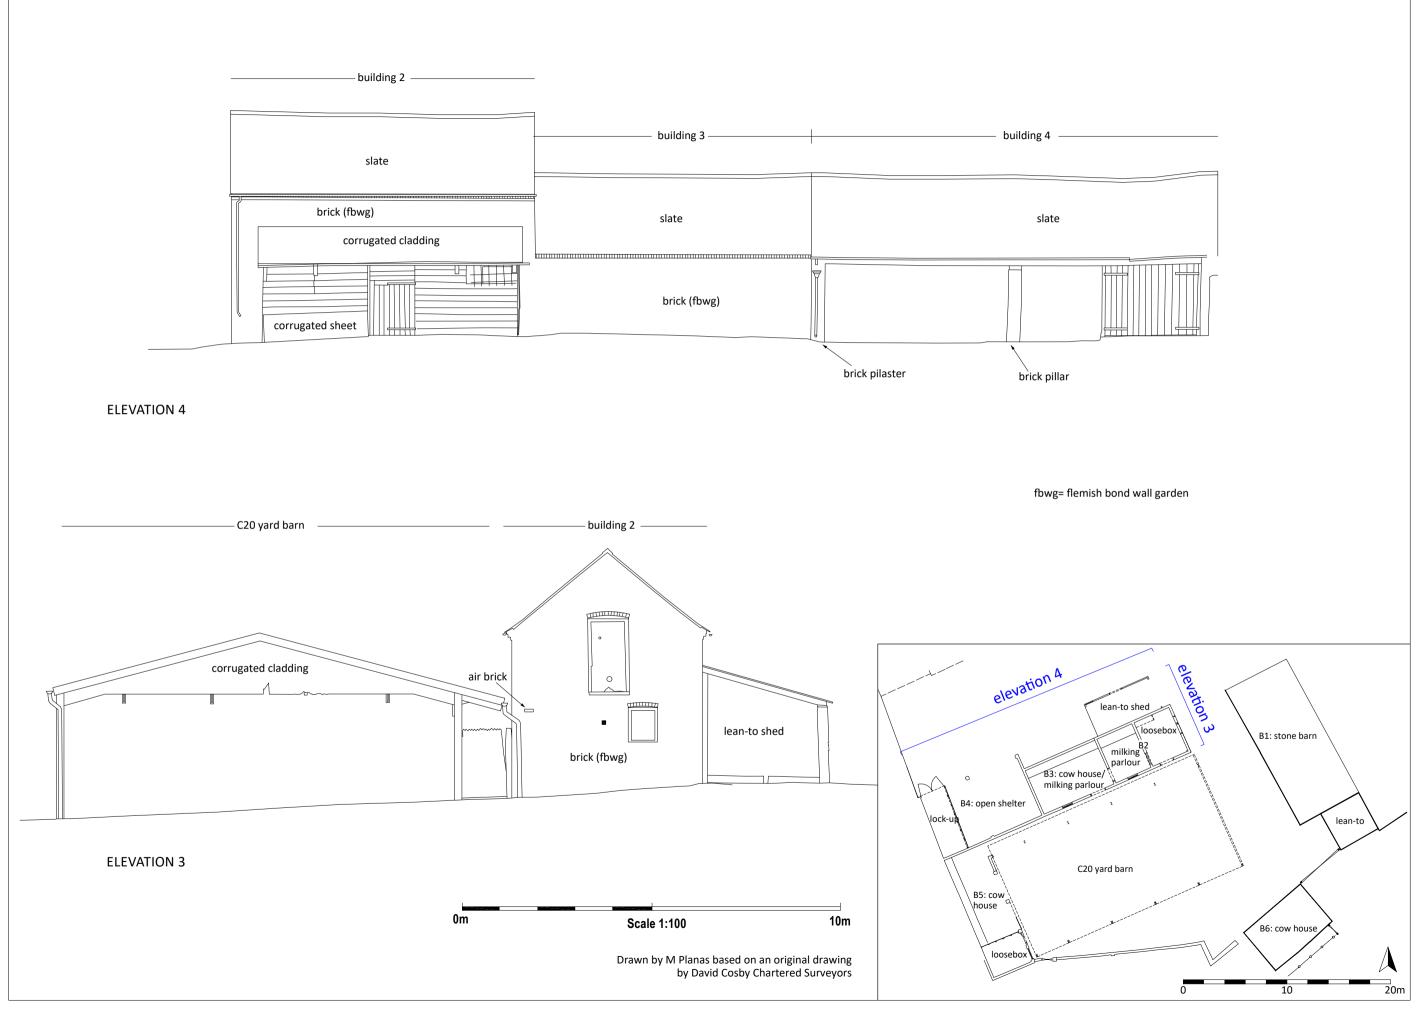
Buildings 2 to 4. Elevations 3 & 4
